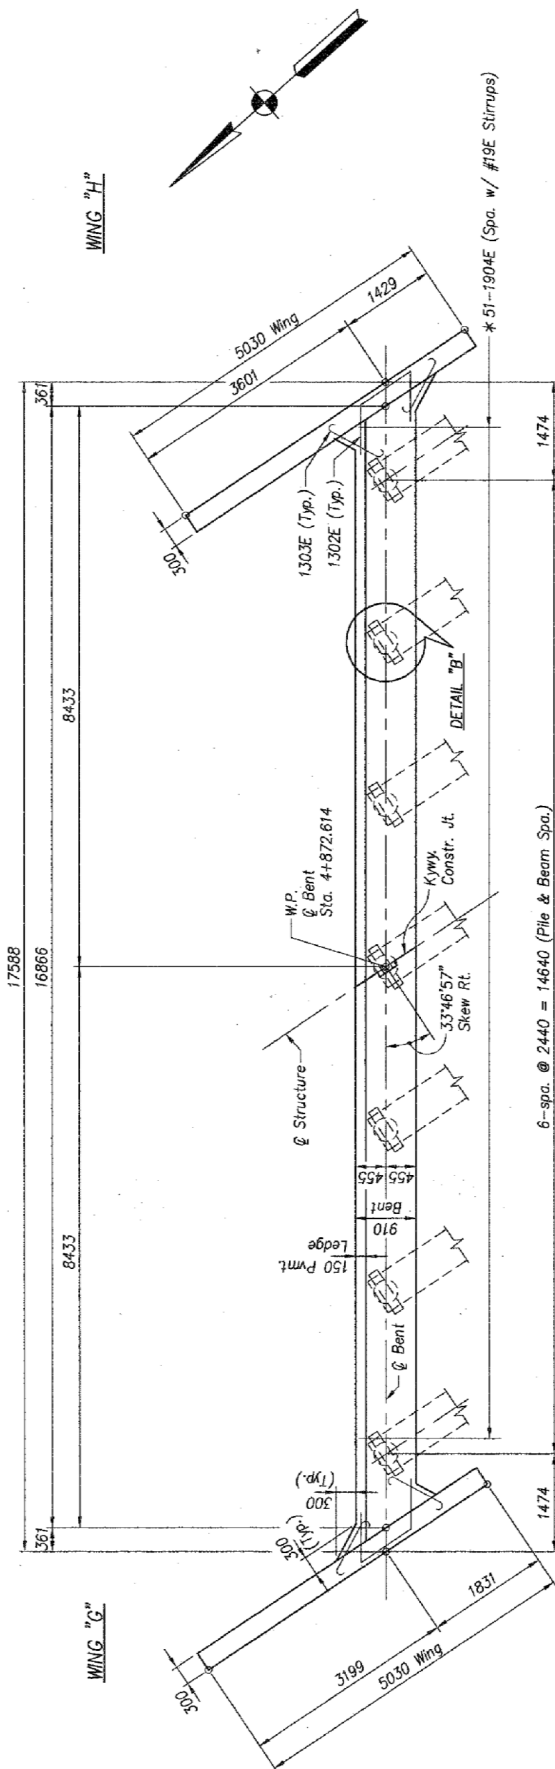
Plan and Elevation Views of Bent 1 (I65 over US25)
